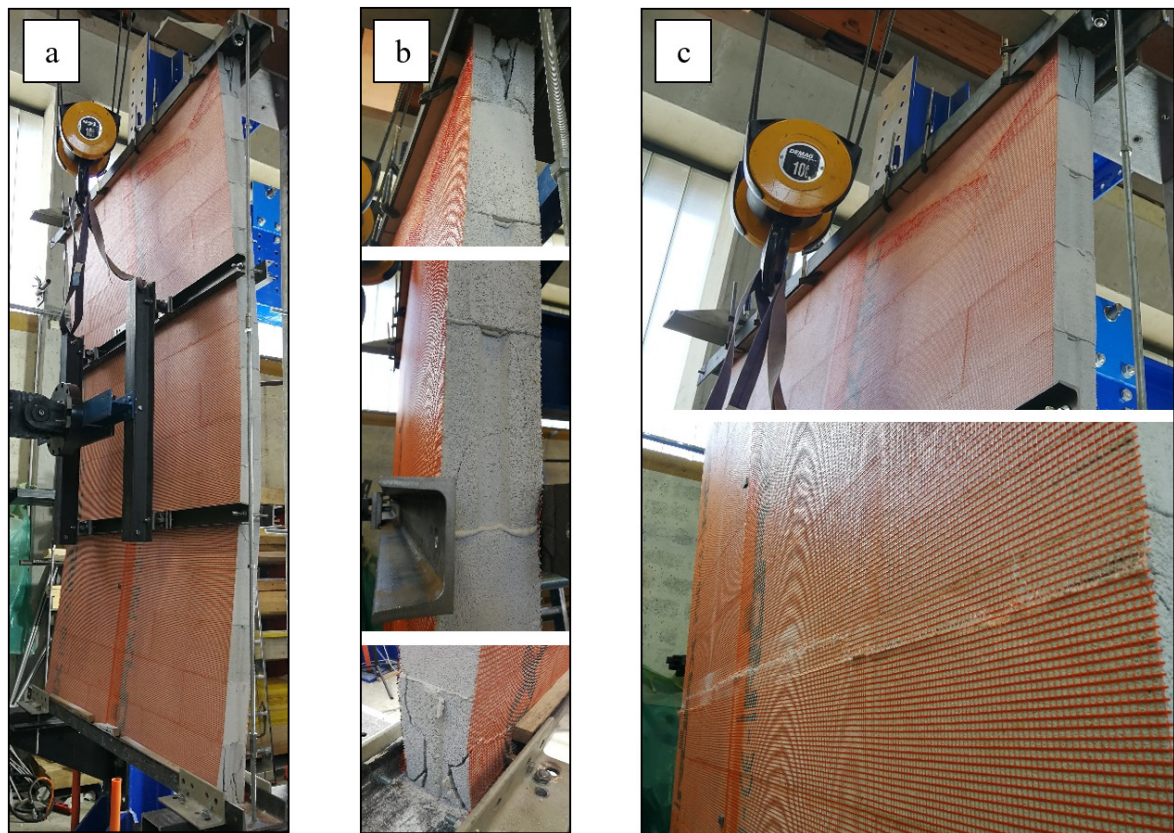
Testing of the non-structural wall specimen YT-2B: (a) Deformation shape, (b) specimen's damage occurred during quasi-static cyclic testing.
